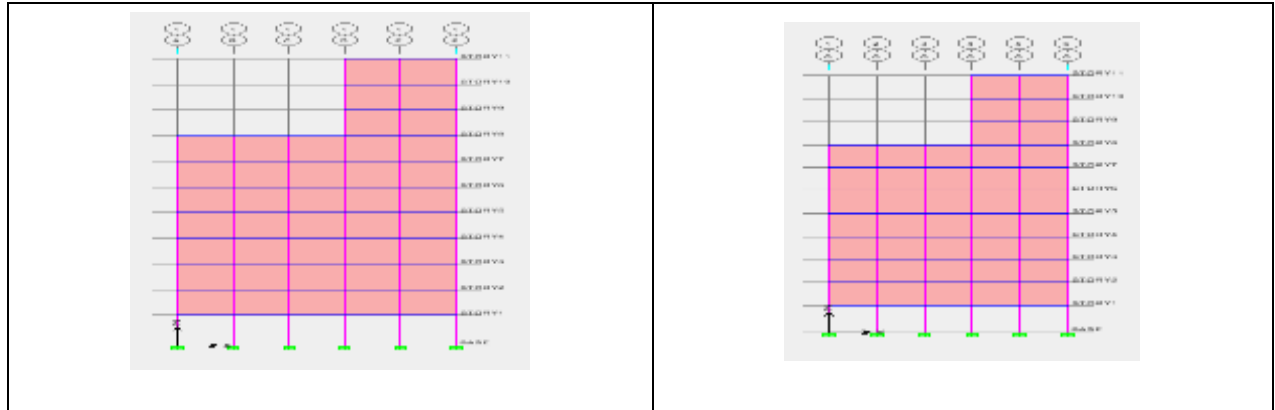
Elevation of Asymmetric building of Model-2 along longitudinal and transverse direction
